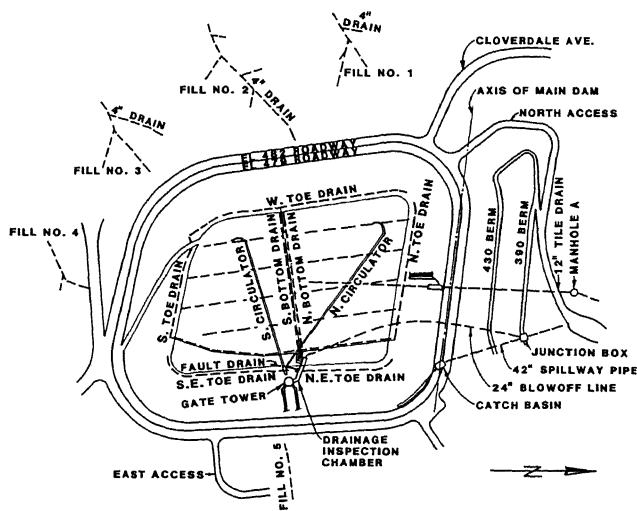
Plan of Foundation and Reservoir Drainage Systems
